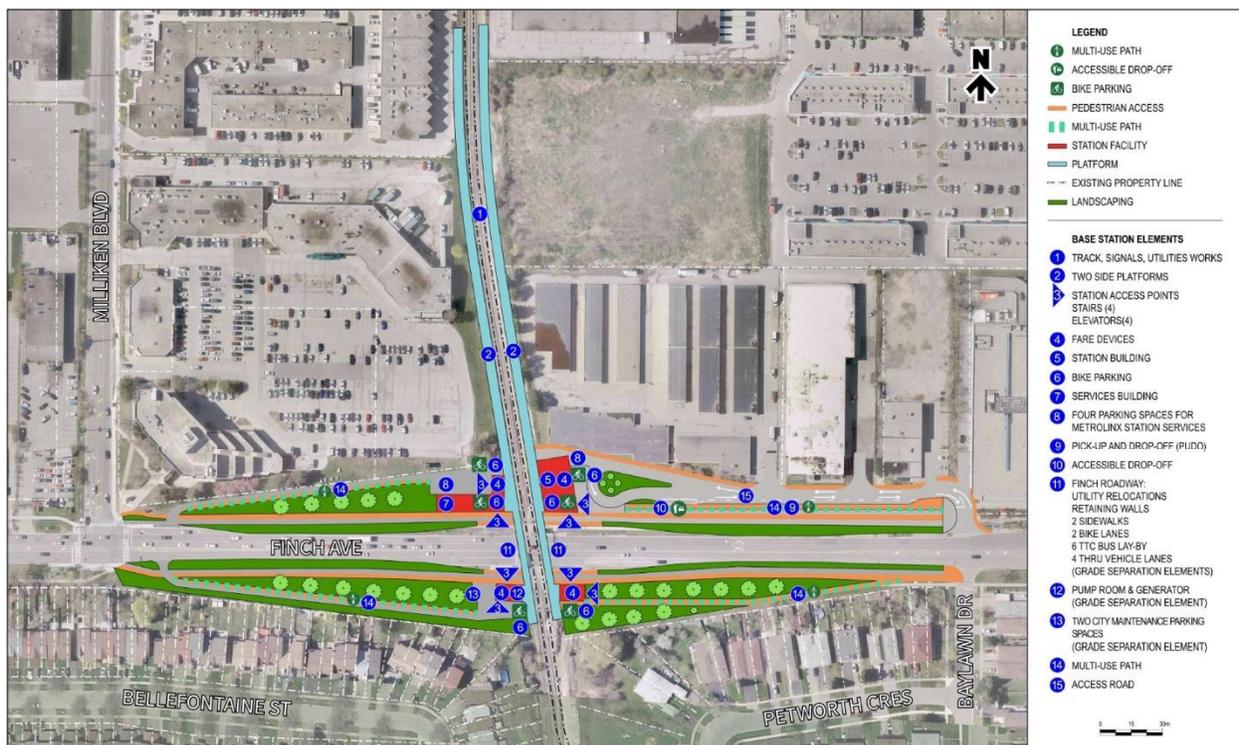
Conceptual plan of Finch-Kennedy Station. Source: Metrolinx (December 2020). Note: Station plan shown above is indicative, and does not represent a final design.
